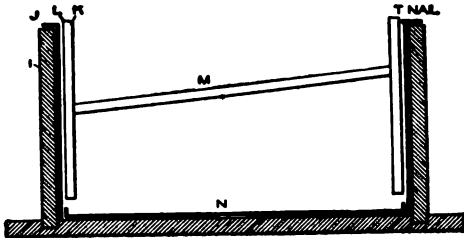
Section Showing Lead Lining in Place, and Method of Bracing for Making Upright Seams.
